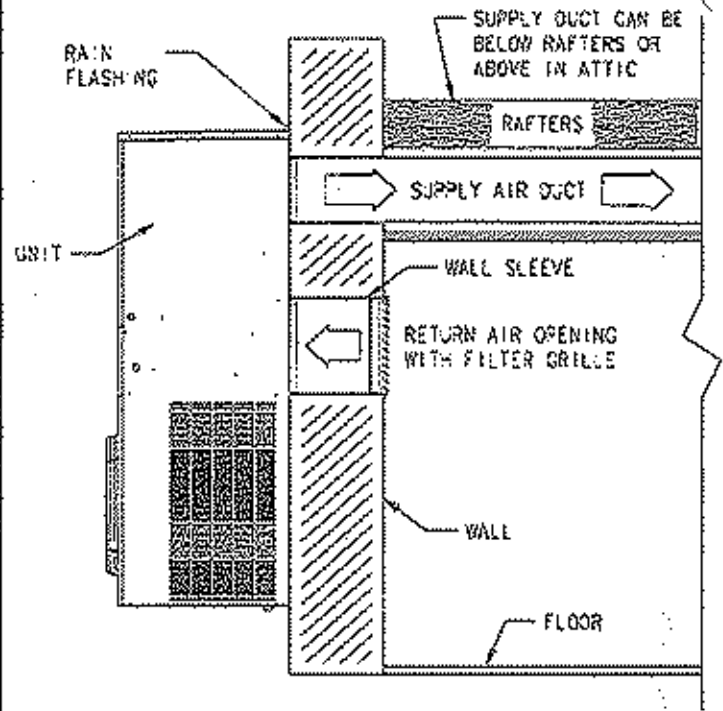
COMMON WALL MOUNTING INSTALLATIONS
